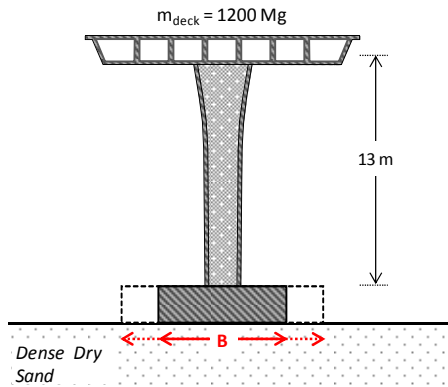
Problem definition : an idealized bridge pier on shallow foundations of varying dimensions.
